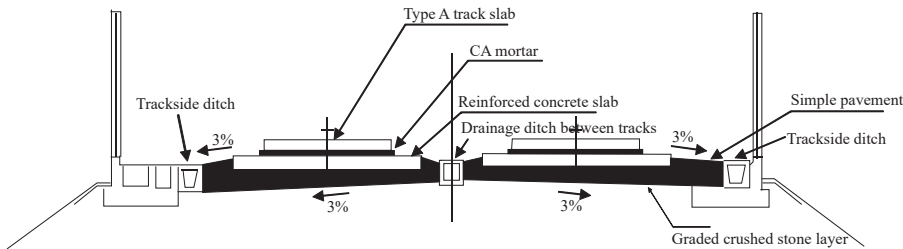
Schematic cross-section of concrete surface layer of subgrade bed for ballastless tracks in Japan
